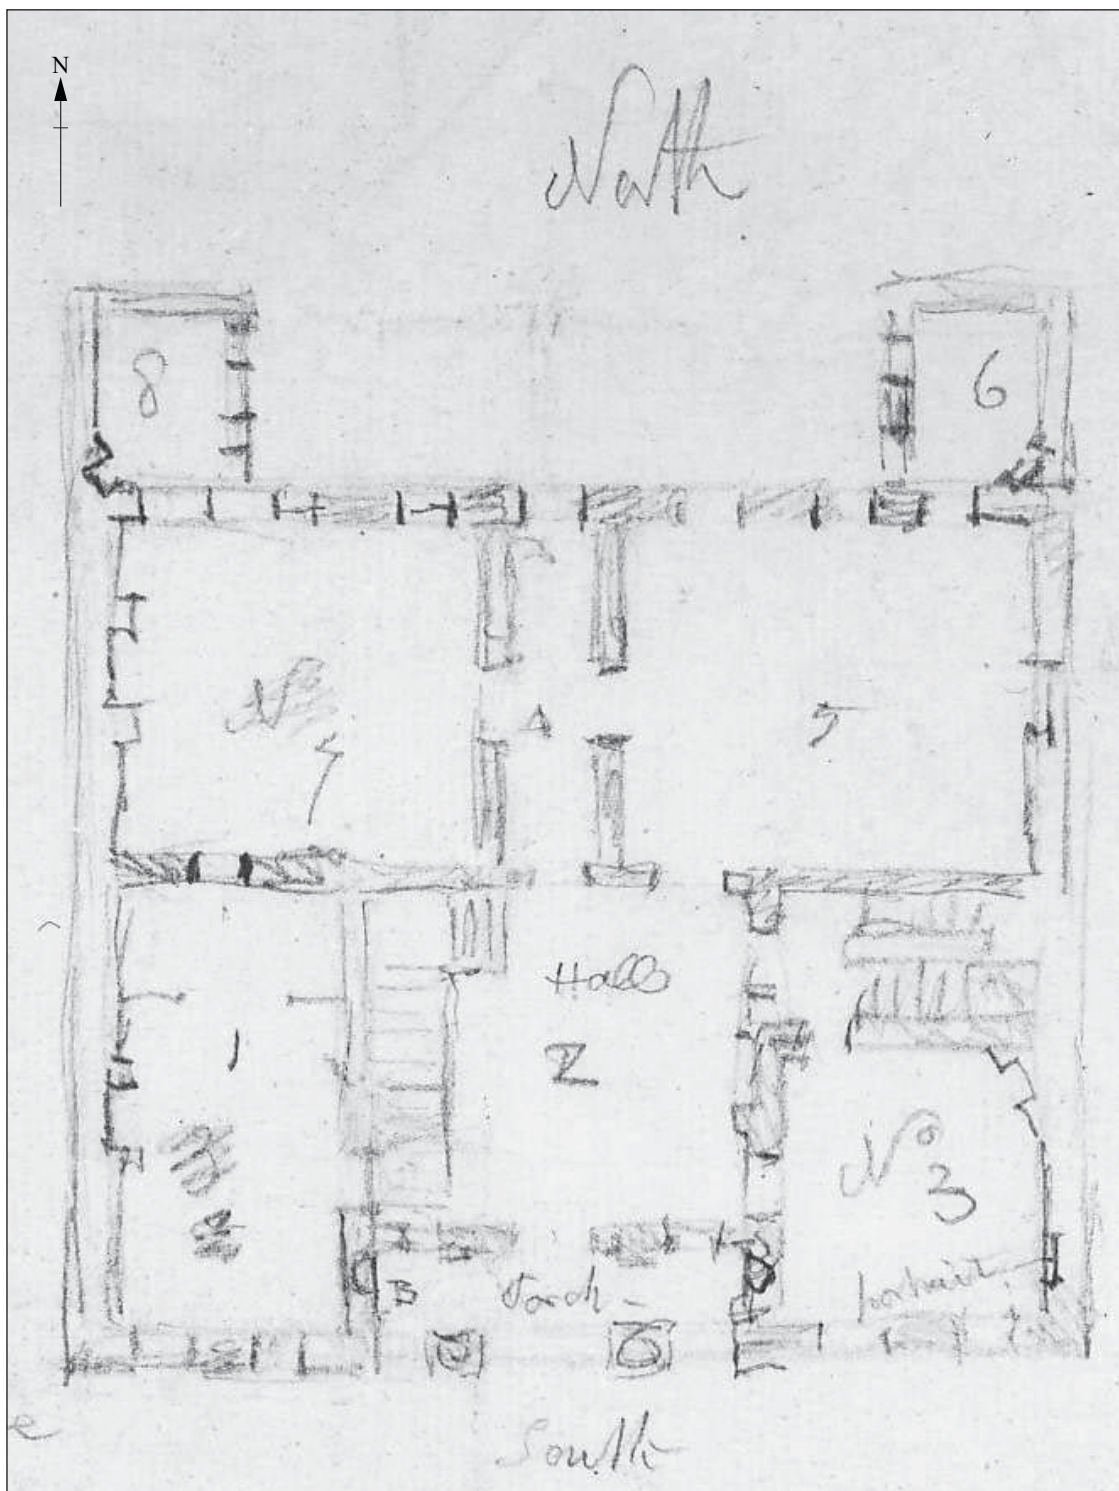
First floor plan of Russell House, 43 King Street, Covent Garden, by Carter, 1800 (image from CAP Studios and City of Westminster Archives)
